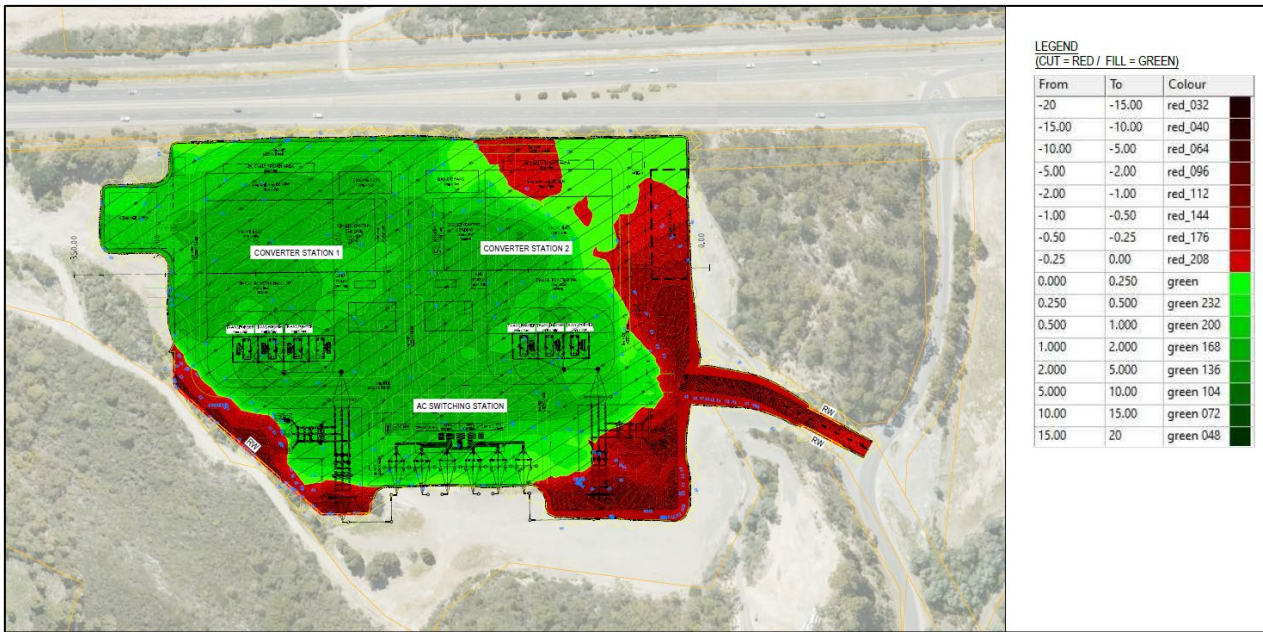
Heybridge converter station site cut/fill plan (sourced from Jacobs, 2022b)
